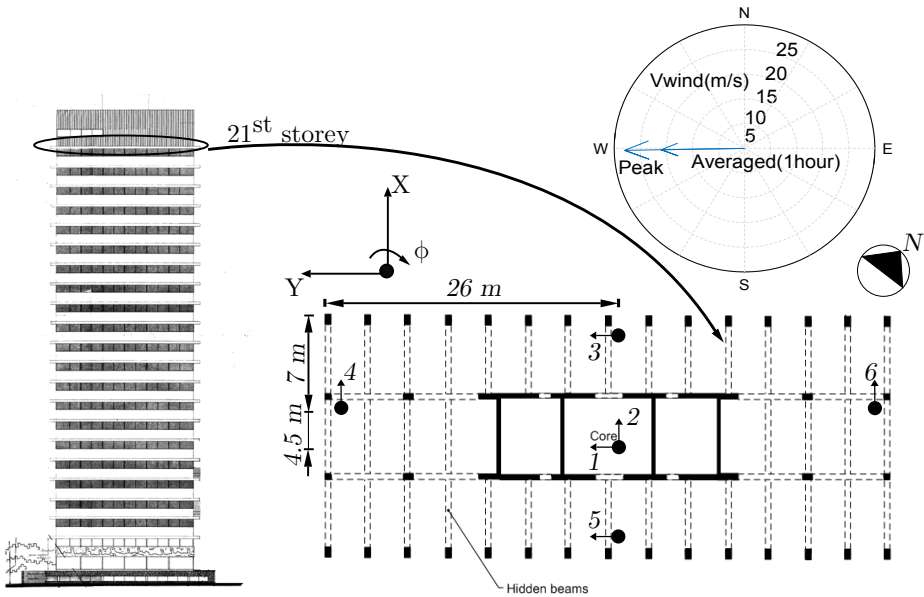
Churchill Tower layout, instrumentation set-up and measurement wind conditions.
